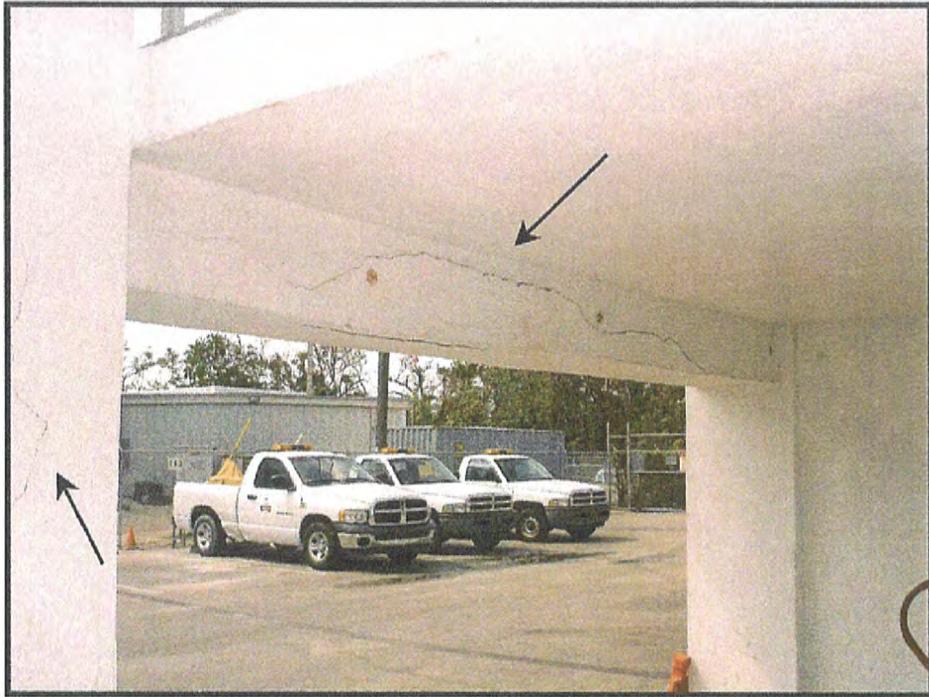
Delaminations along concrete support beams and columns for North exterior stair.
